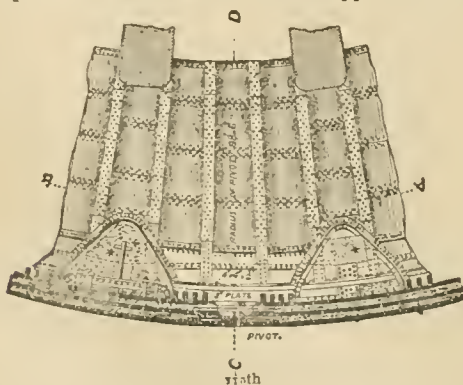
Plan of Sea Fort, with continuous Iron Wall. The piers marked (\*) are filled with concrete.
